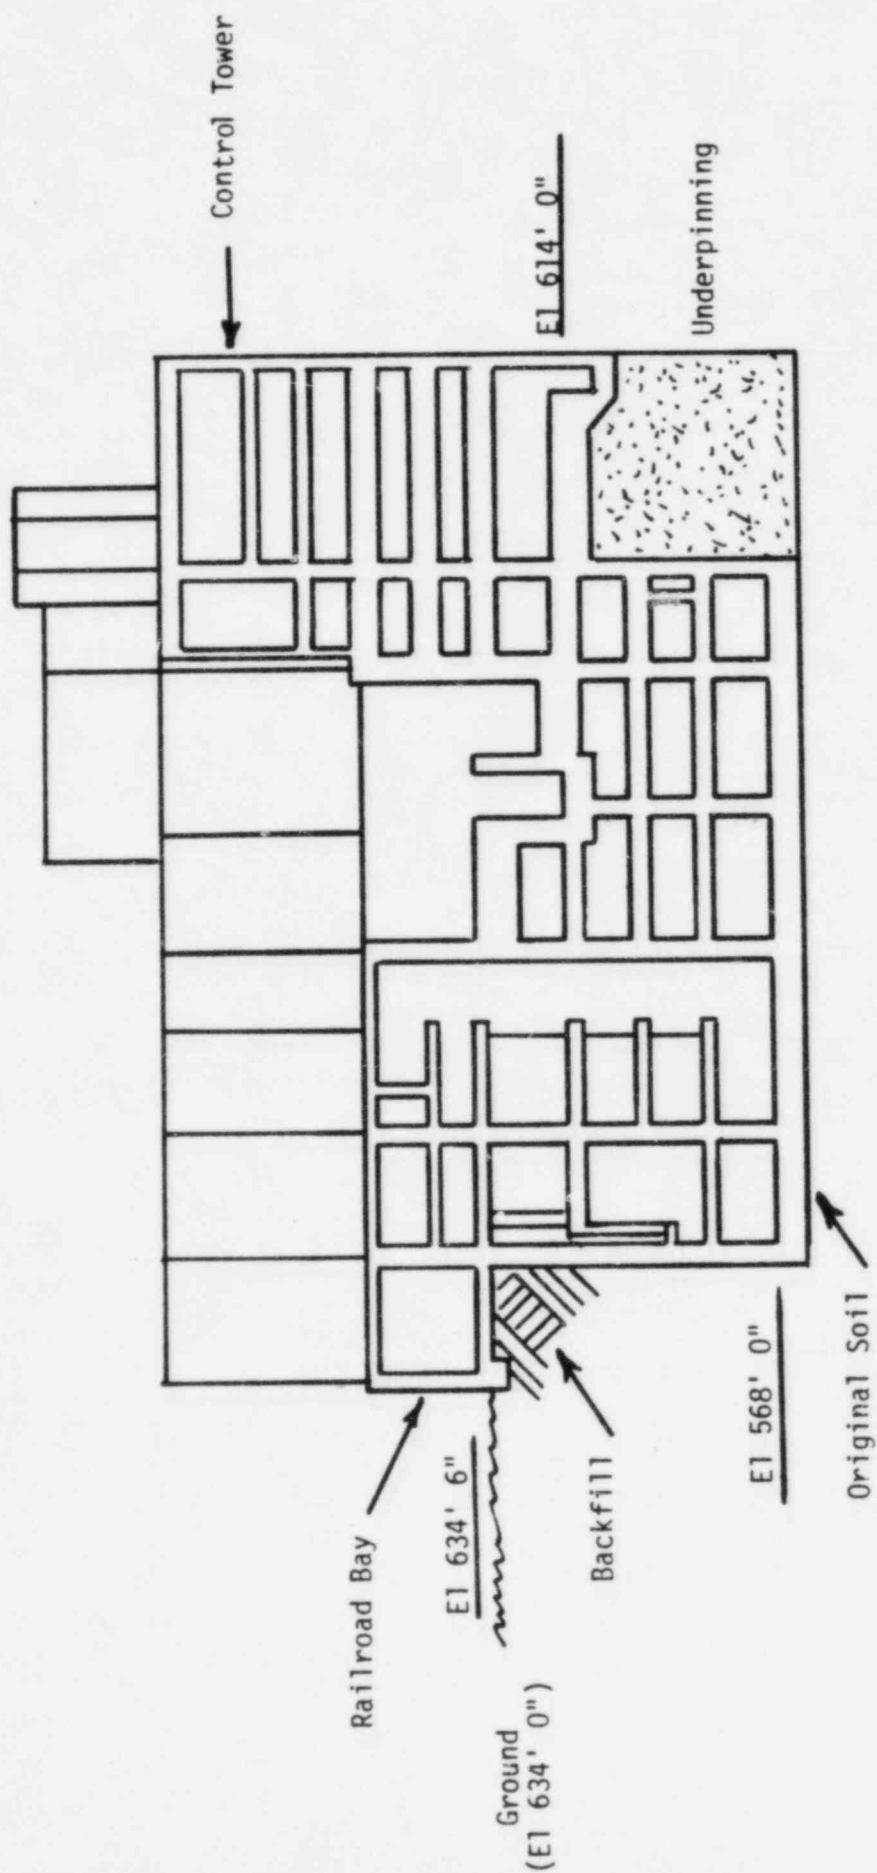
SECTIONAL VIEW OF AUXILIARY BUILDING AND CONTROL TOWER SHOWING UNDERPINNING
